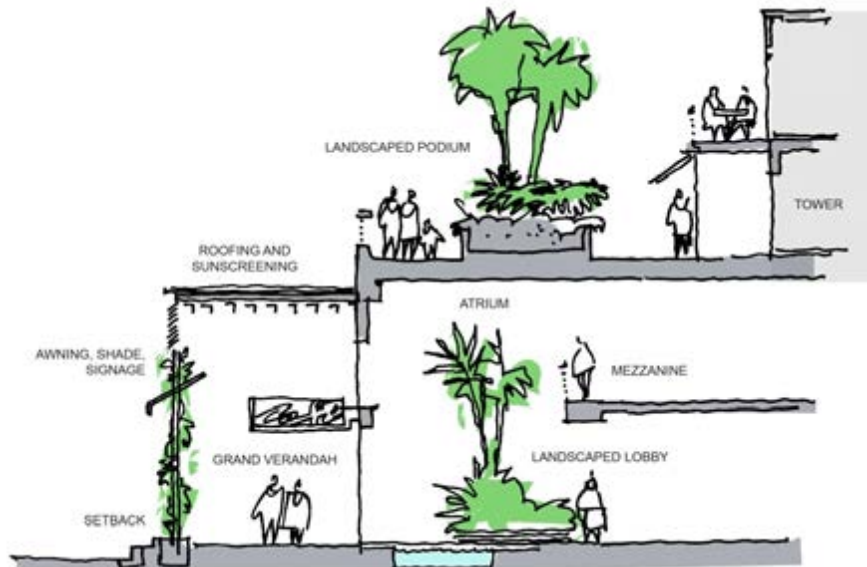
d – Street canopy (typical cross section)
